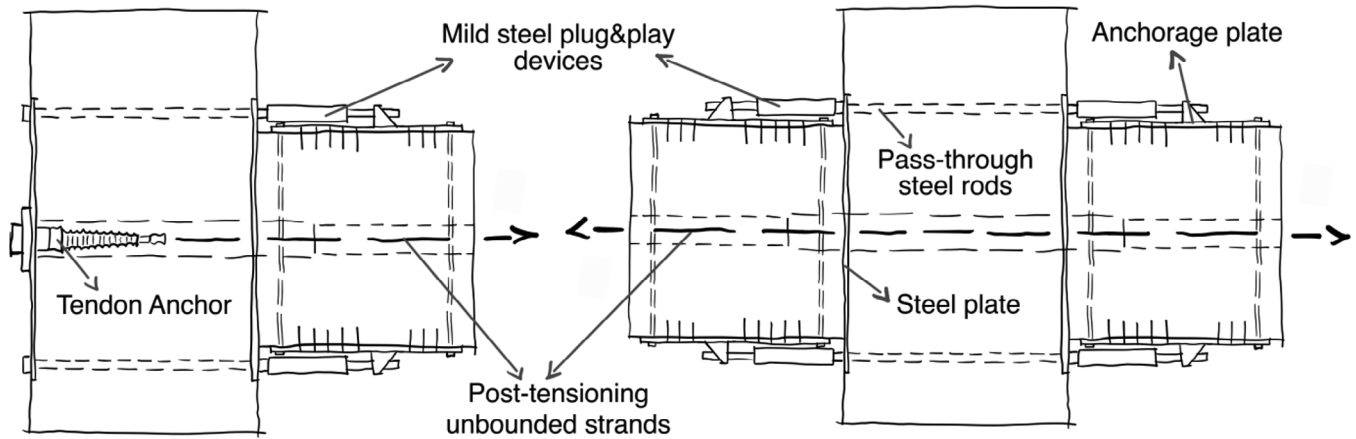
A sketch of the connection details for both external and internal beam-column joints.
